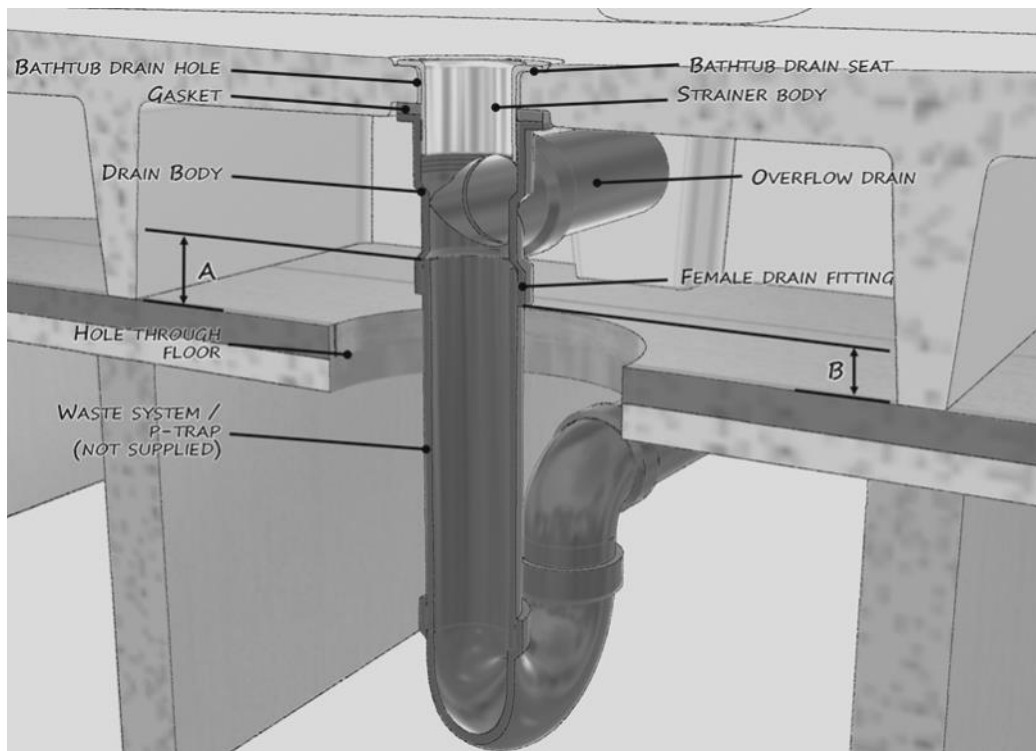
Half-section view of drain system connected to waste system, cut in half along long axis of bathtub
